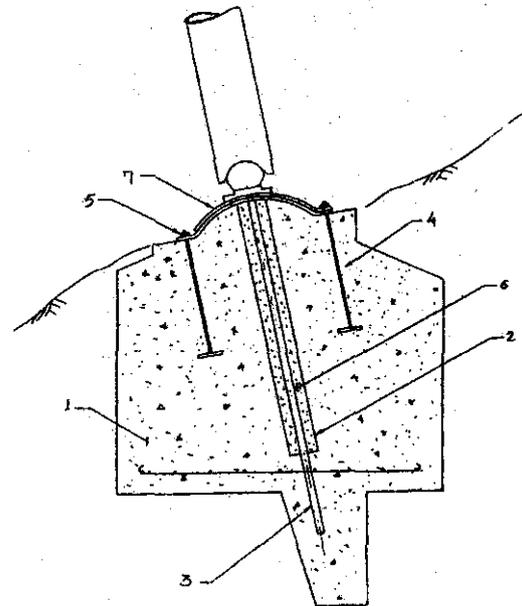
Swivel post with articulated ball and socket joint arrangement showing (1) concrete M-20, (2) sleeve MS, (3) anchor bolt, (4) foundation bolt, (5) nut and washer, (6) resin, and (7) base plate.
